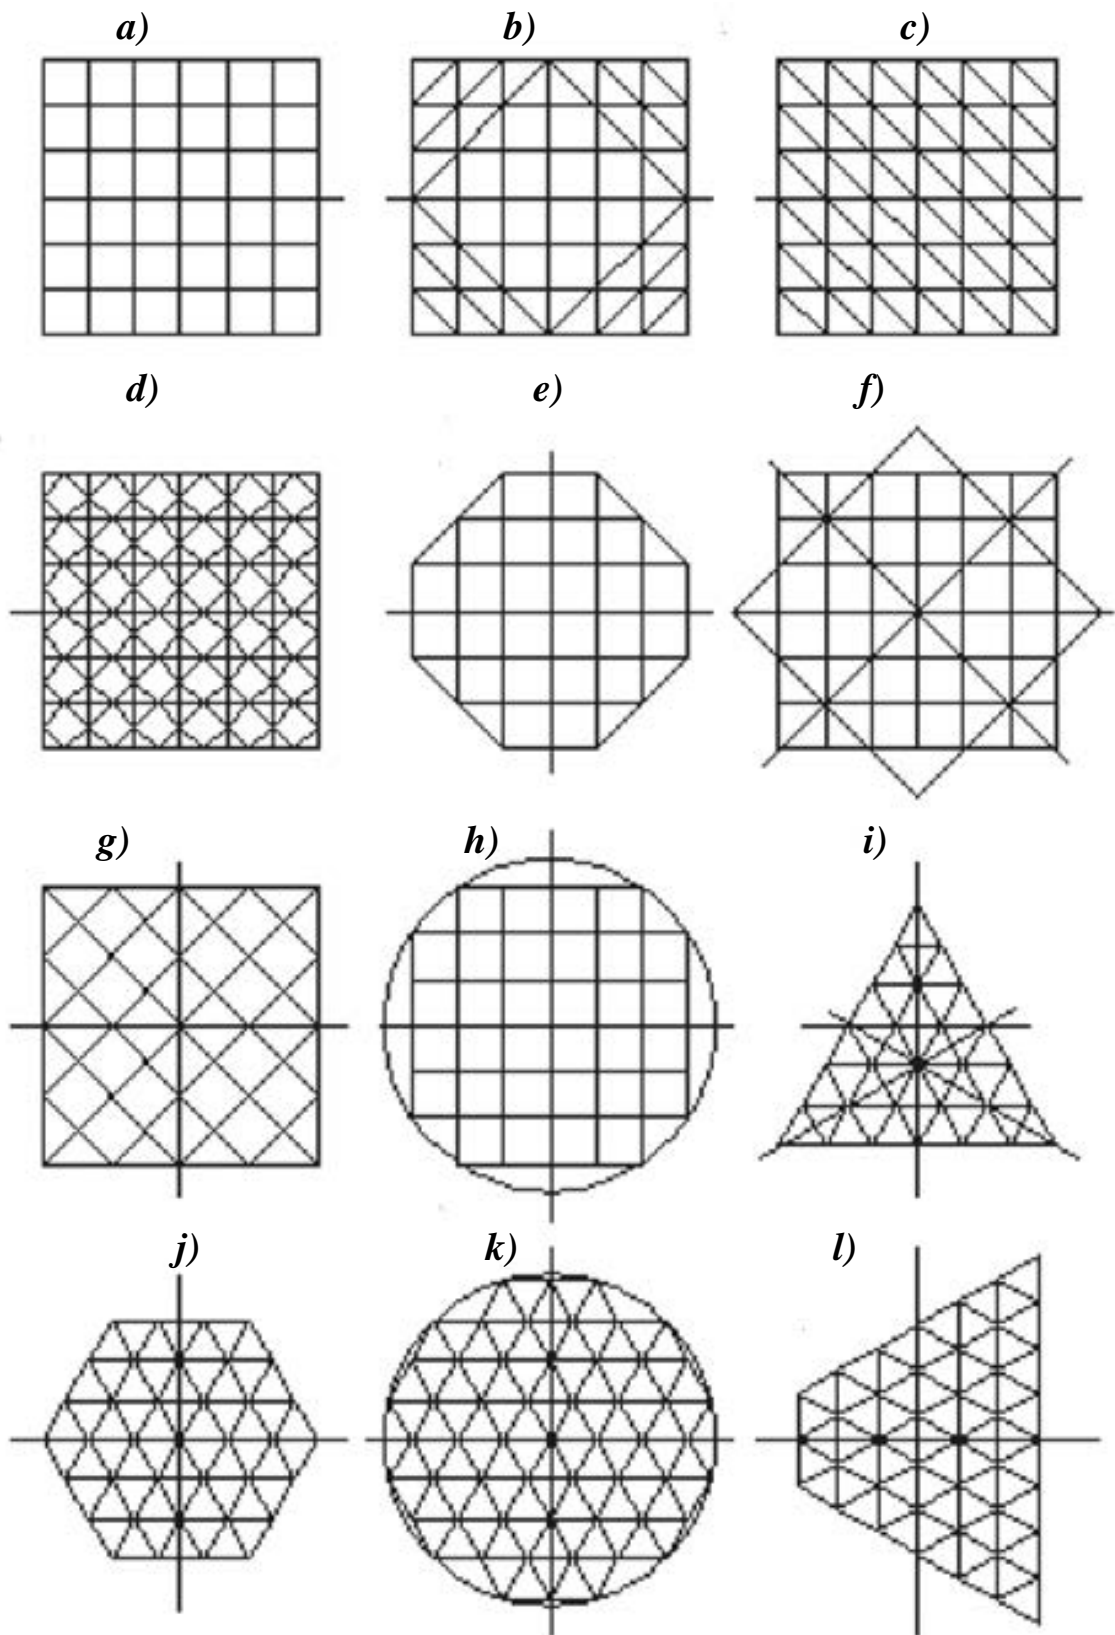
The main schemes of roofing from cross beams and trusses
